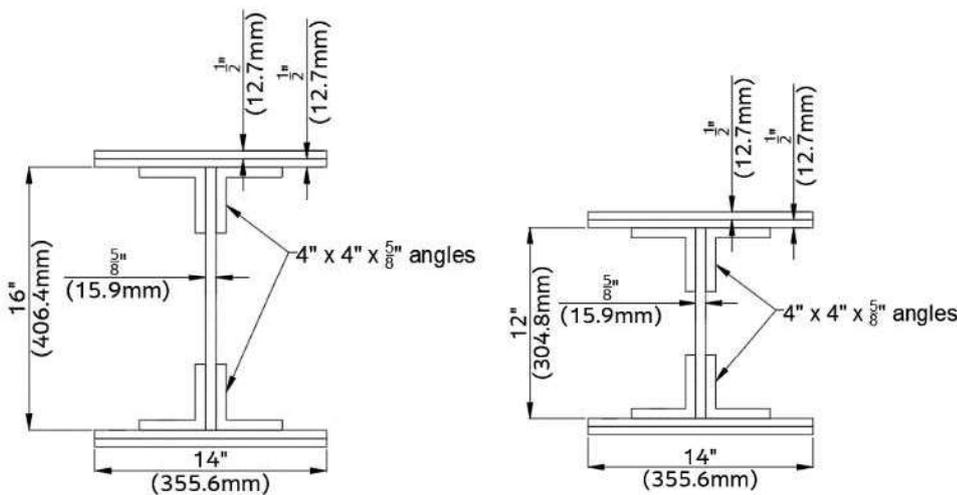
Girders 20 and 35 cross sections (Midspan left, support right)
